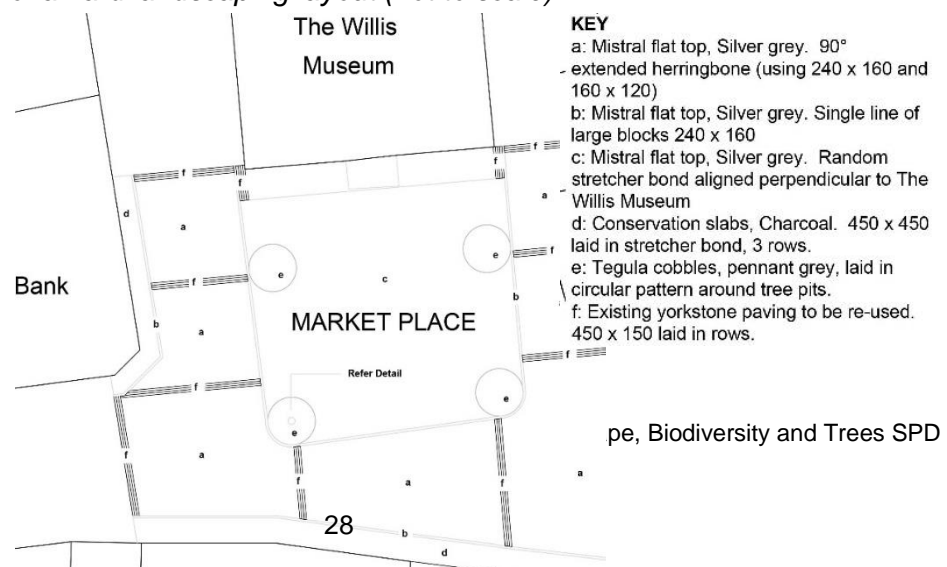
An example of a paving detail from the hard landscape layout (Not to Scale)
